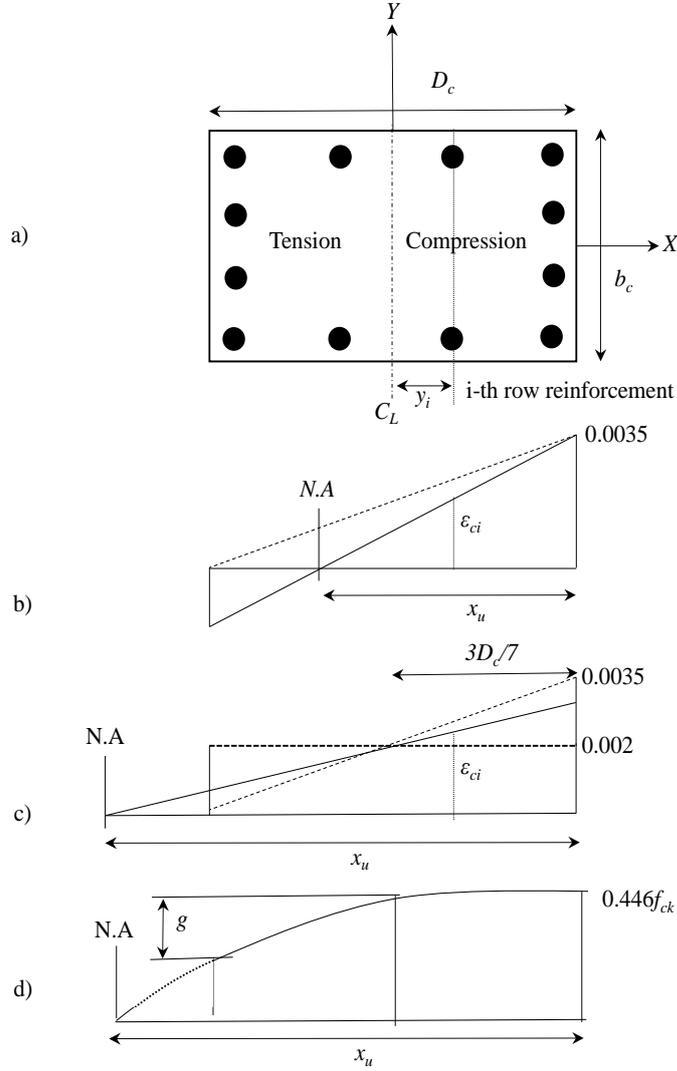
a) Typical reinforcement detail of column section b) Strain diagram of concrete section when neutral axis lies inside the section c) Strain diagram of concrete section when neutral axis lies outside the section d) Stress diagram of concrete section when neutral axis lies outside the section
